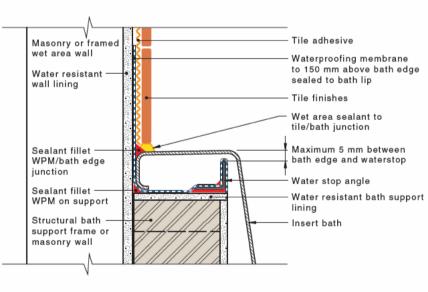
(B) — Shower over bath — Fitted bath — Fitted against wall
